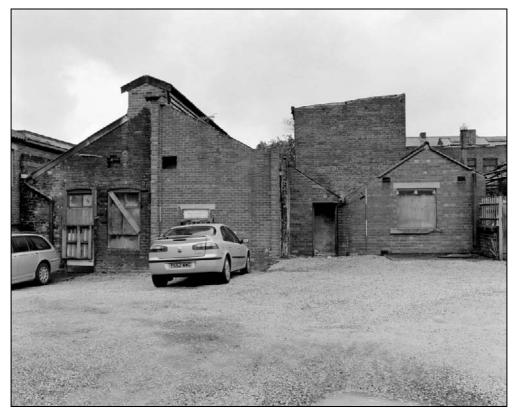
General view of the east elevations of the machine shop and wash house range (film 5.7)
